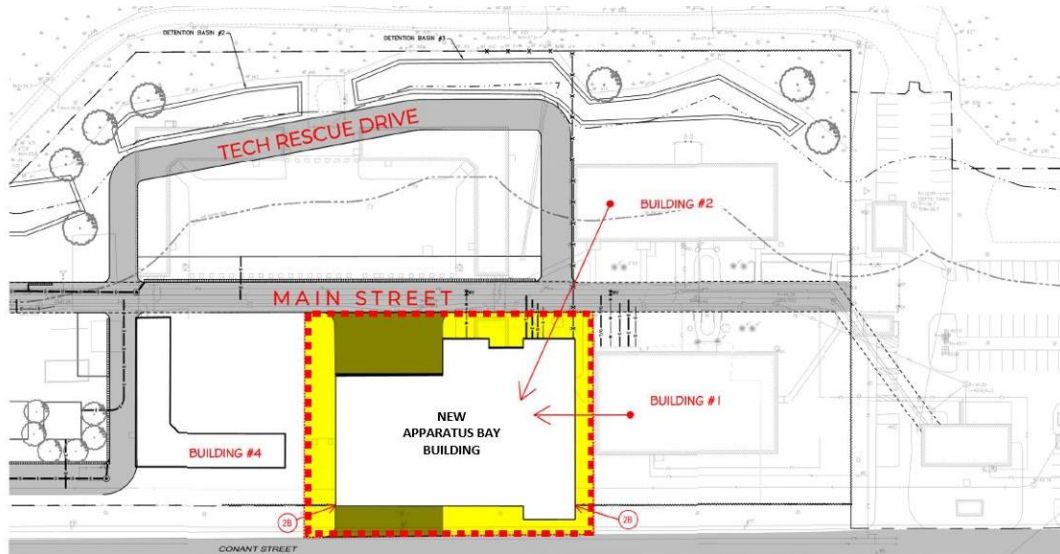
Site location of the new DFS Bridgewater Apparatus Bay Building
